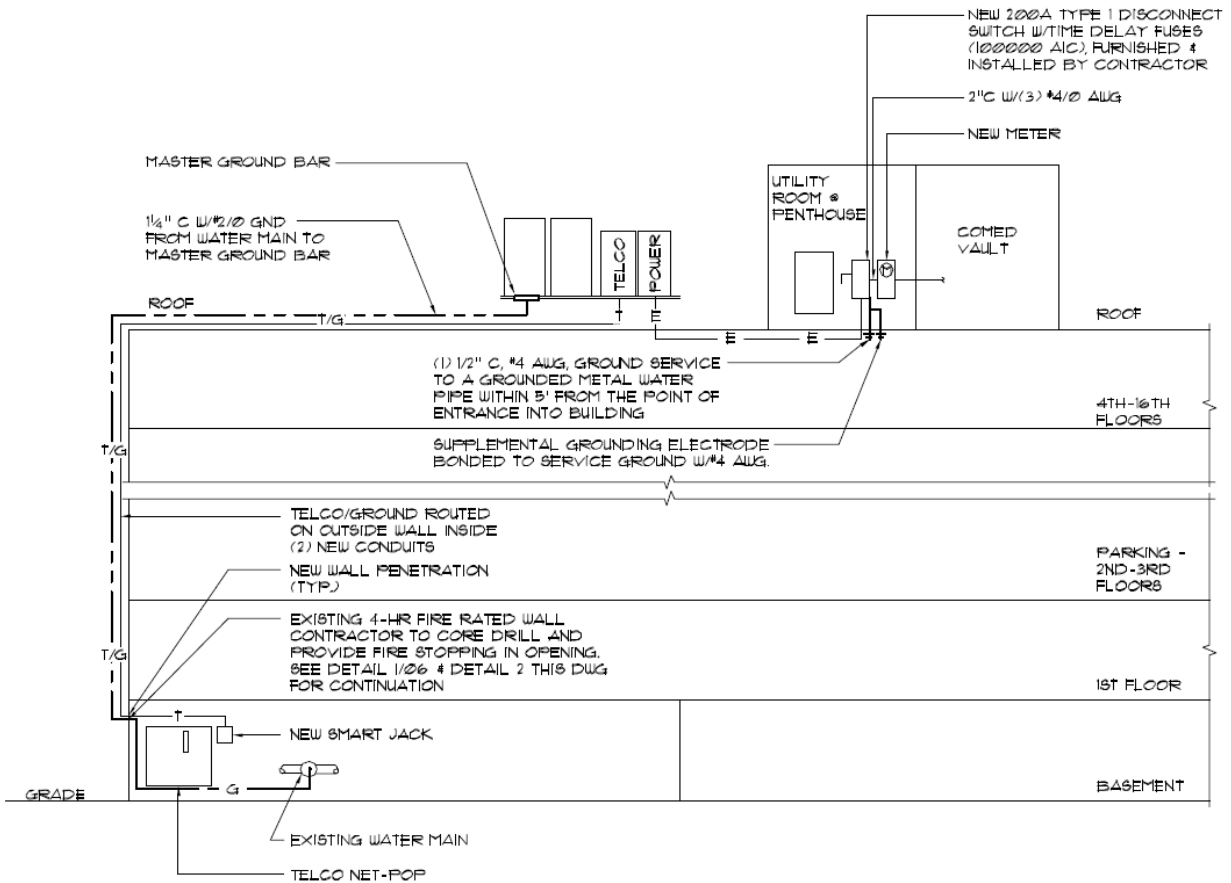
Site Elevation Drawing of a Proposed Collocation of Antennas on the Rooftop of a Building in Chicago, Cook County, Illinois (Case Study 2)
